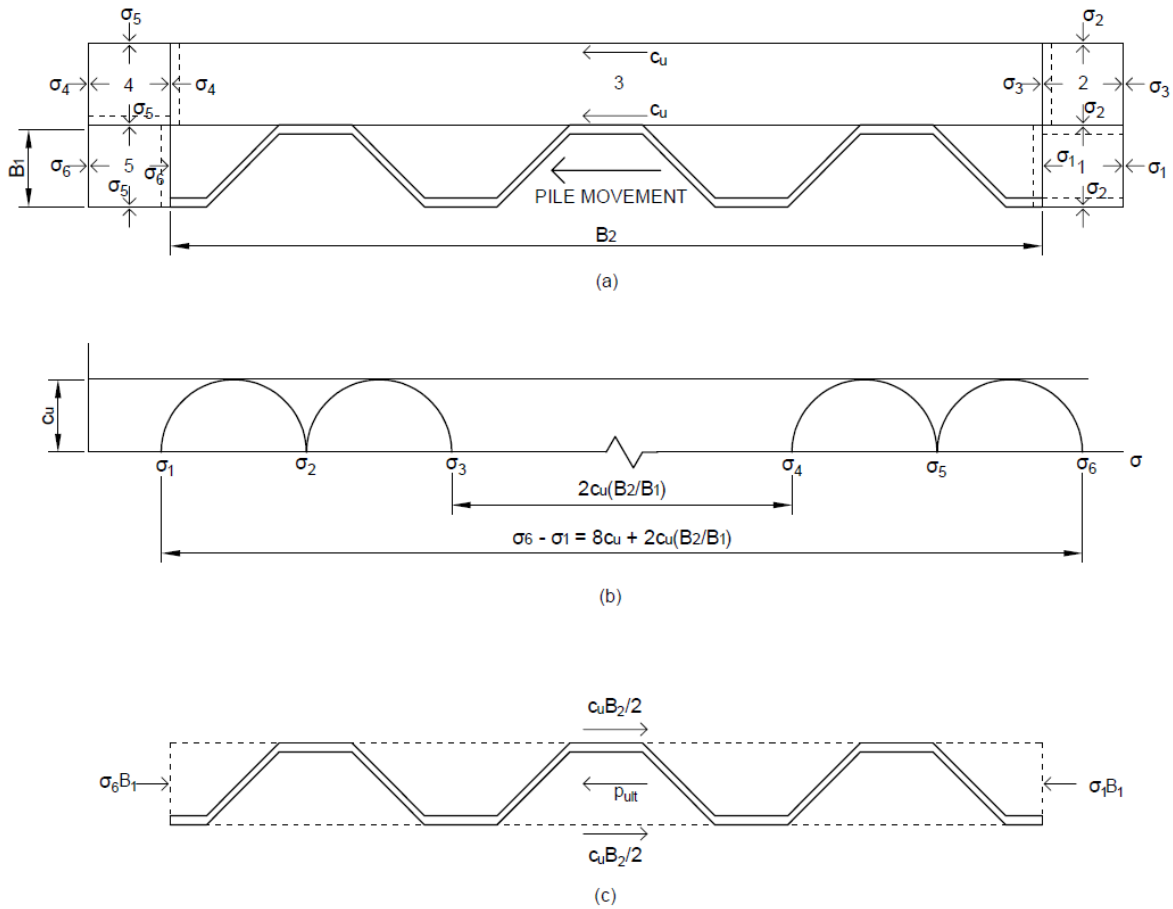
Assumed block failure model for clay. (a) Section through sheet pile (b) Mohr-Coulomb diagram (c) Forces acting on sheet pile.
